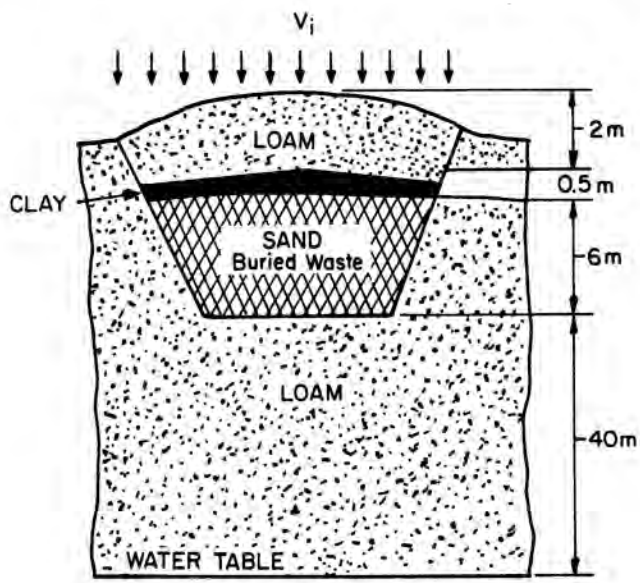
Vertical Cross Section of a Shallow Waste Disposal Site.
